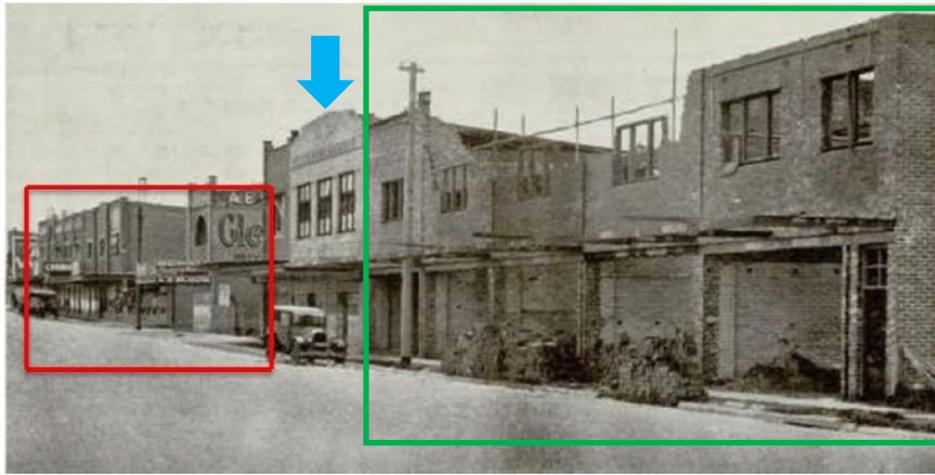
A photo of the north side the Ashburton Shopping Centre, published in 1934. The building at 269-271 High Street is evident, indicated by the blue arrow. The five two-storey brick shops and dwellings at 273-281 High Street) are shown under construction (outlined in green). The two-storey shops, believed to be 245-253 and 259 High Street, constructed in the 1920s, are outlined in red ('Tower Hill Estate' 1934).
